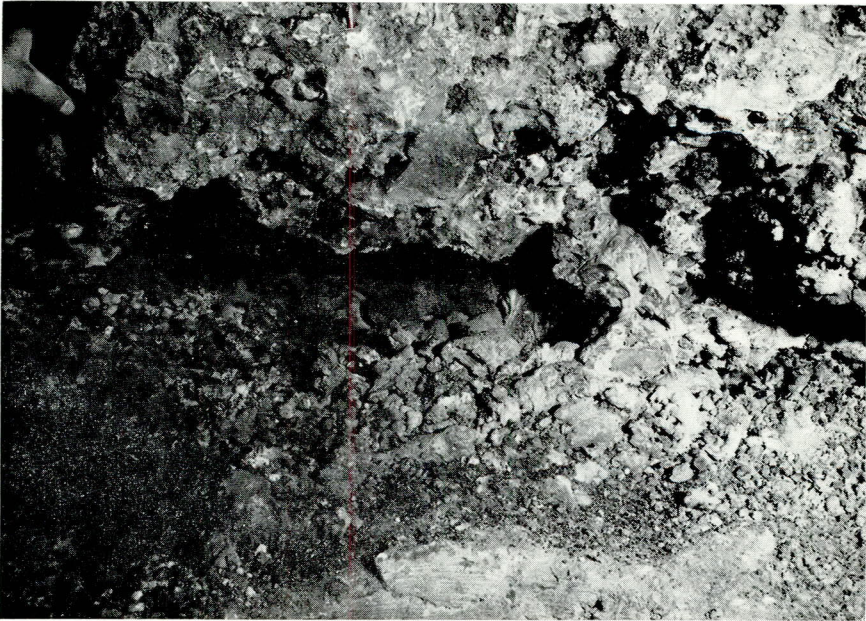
Exposed cavern in wall of core boring 30C-1 at elevation 577.0 in left abutment.
